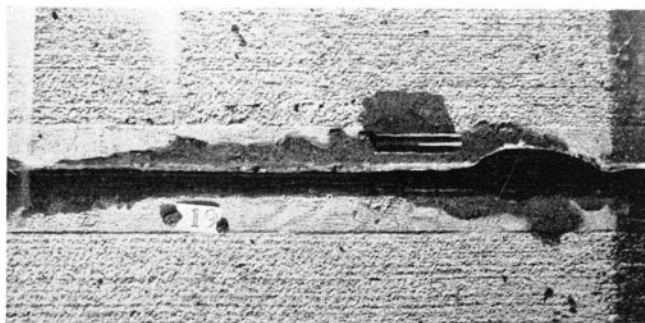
SLIGHT SPALLING ALONG J-4 EXPANSION JOINT
